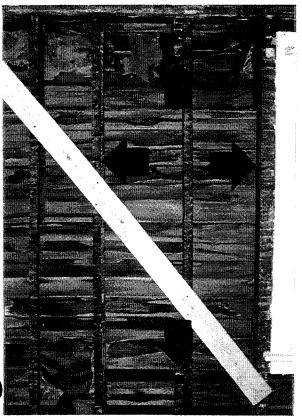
1851 COTTAGE WINDOW JAMB DISCOVERED IN WALL CAVITY
